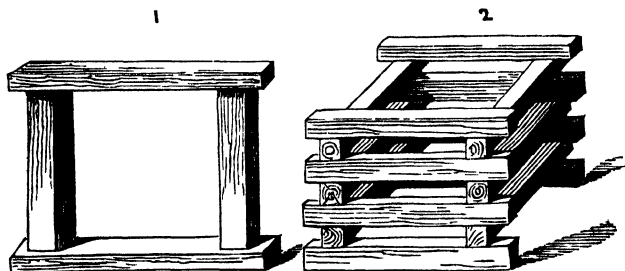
Timber Supports used in Mines. No. 1. Props and planks. No. 2. A "chock" of timber for supporting the roof of a main way.
